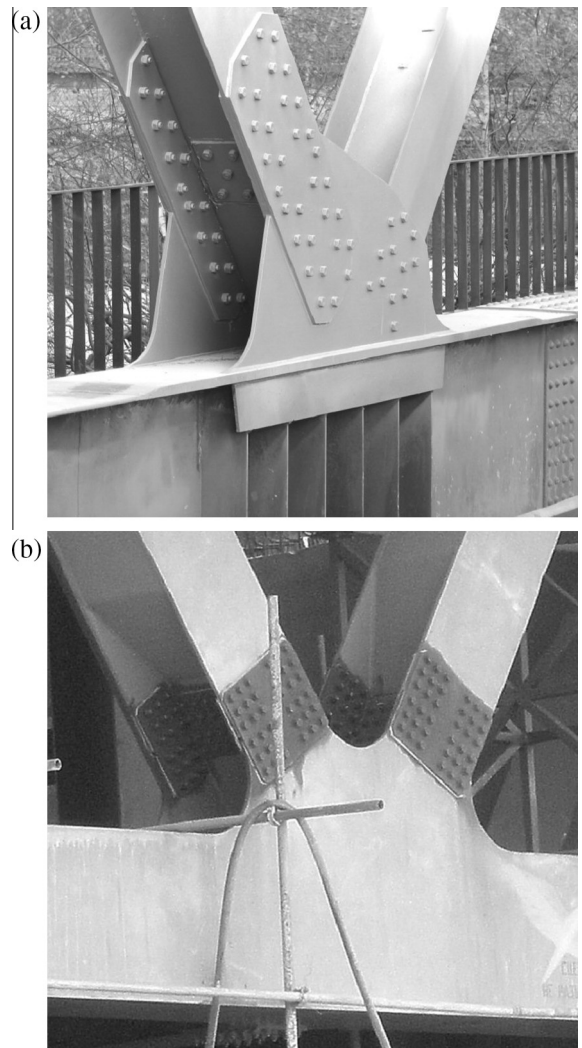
Truss girders joints: (a) twin gusset plates as separate elements and (b) gusset plates integrated into flange side walls.
